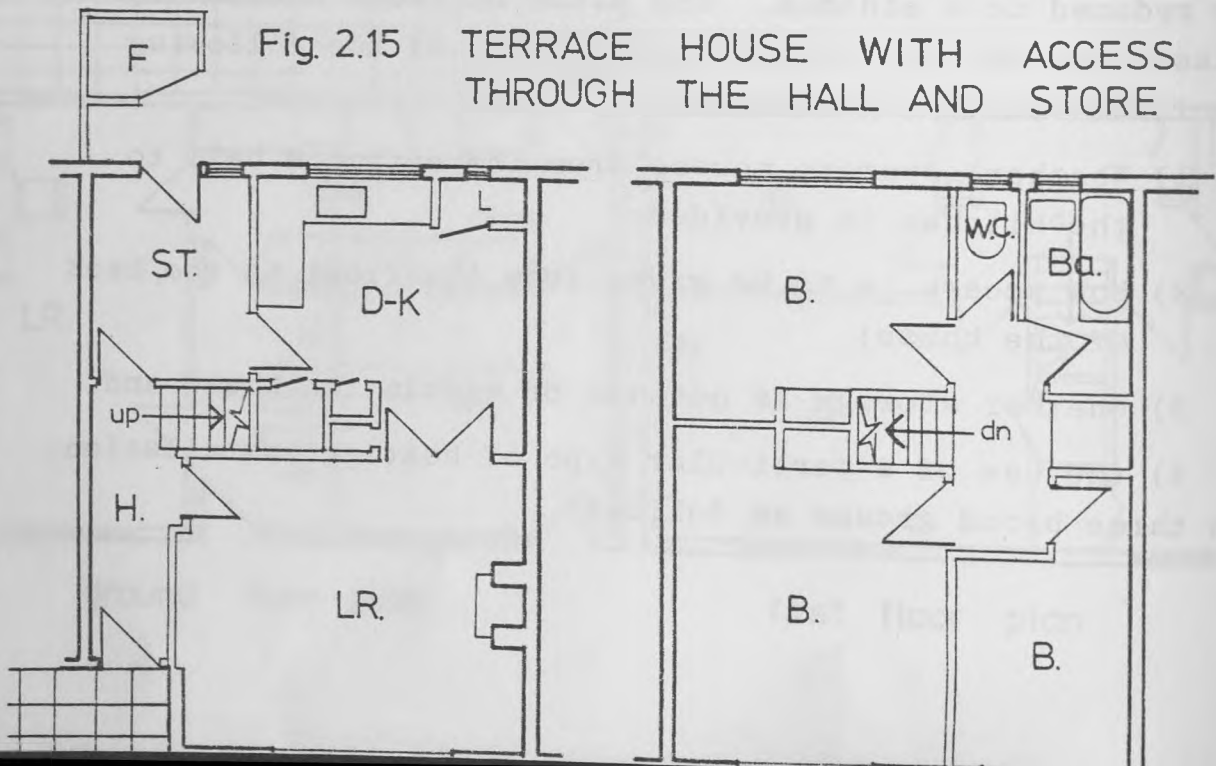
TERRACE HOUSE WITH ACCESS THROUGH THE HALL AND STORE
